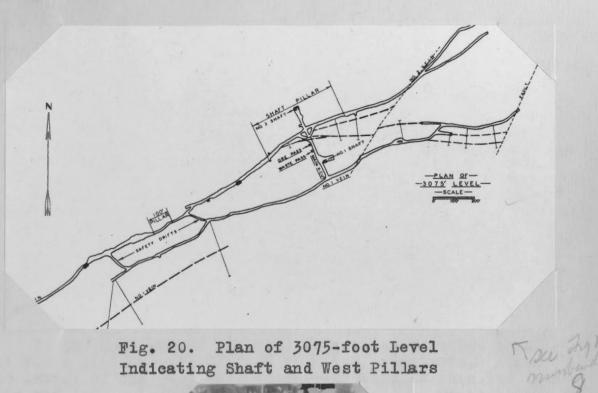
Plan of 3075-foot Level Indicating Shaft and West Pillars
